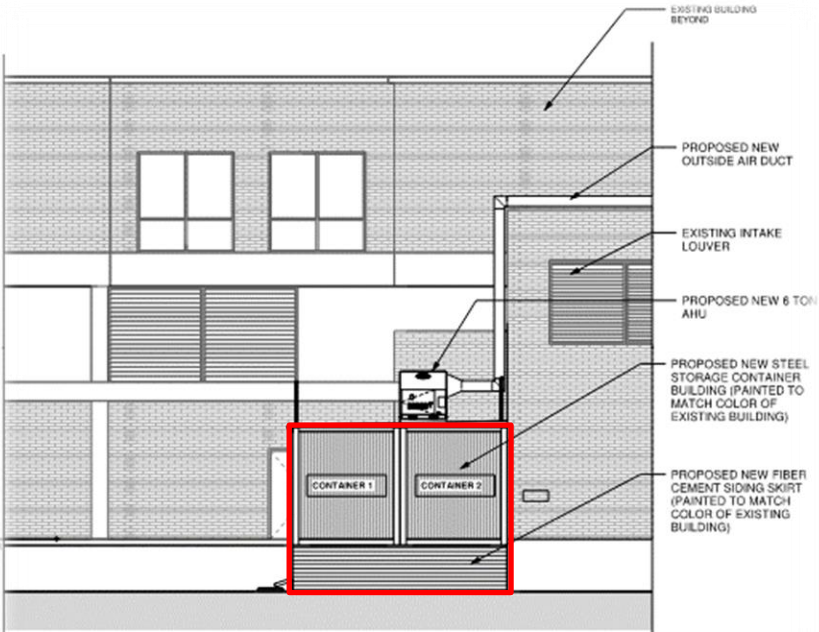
Temporary trailer outlined in red in front of the hospital west elevation
